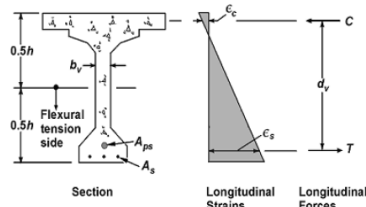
Longitudinal Strain, ϵ_s , for Sections Containing Less than the Minimum Amount of Transverse Reinforcement
